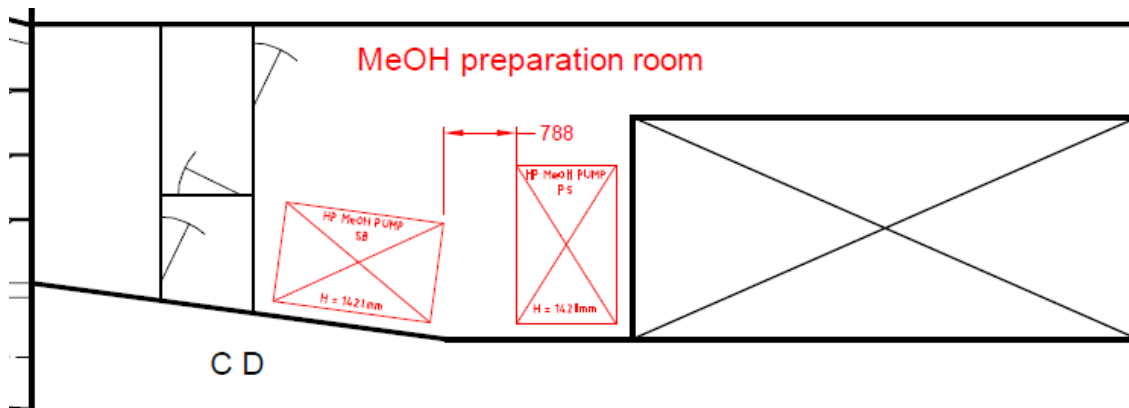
Methanol fuel preparation room SB-side, floor level
